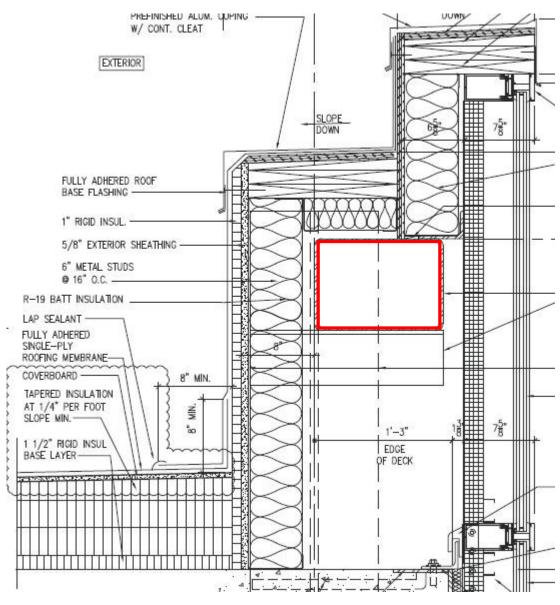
Roof Parapet Section Drawings Courtesy of JCJ Architecture
